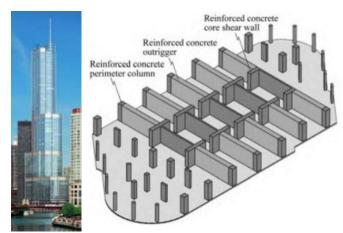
Concrete Structure of the Trump Tower, Chicago
